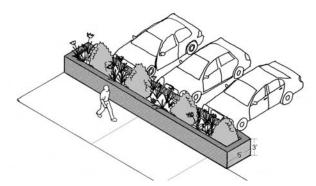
(A)(2)(b). Elevated parking lot planting buffer.
